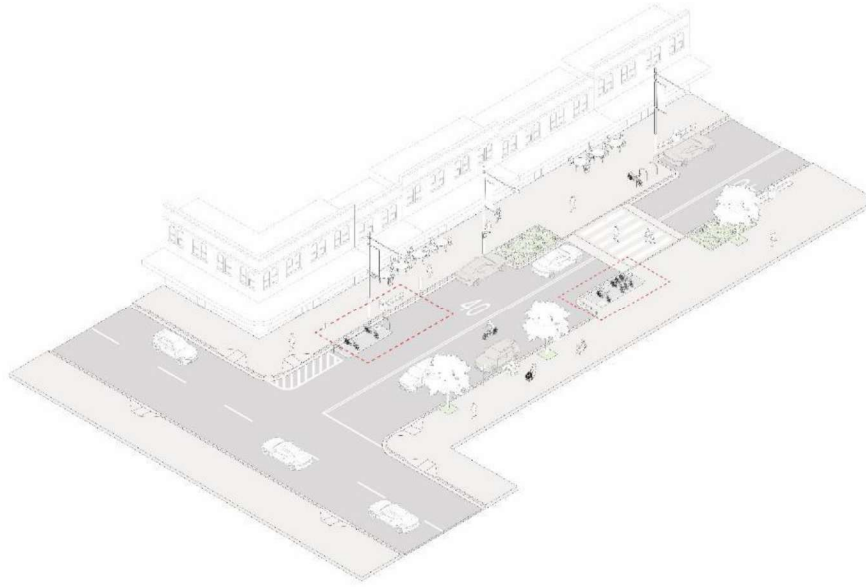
Illustrative examples of integrated on-street and footpath parking bays in a Destination High Street typology
